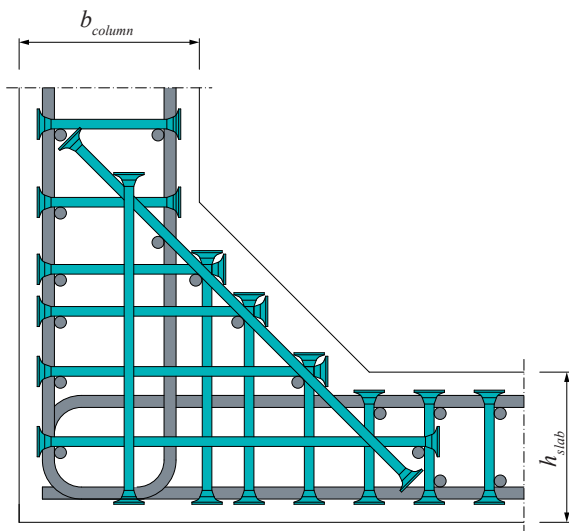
REINFORCEMENT DETAIL OF SLAB TO WALL JOINT IN FOUNDATION ELEMENTS
